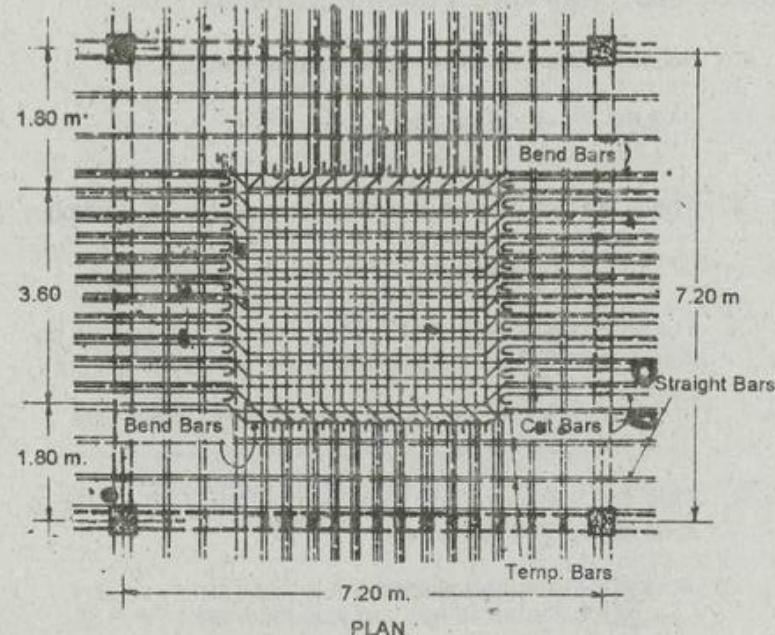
REINFORCEMENT OF TWO WAY CONCRETE SLAB
